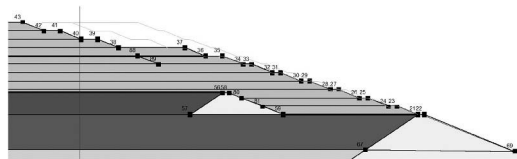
Downstream slope of the dry embankment tailings (at the longitudinal section).
